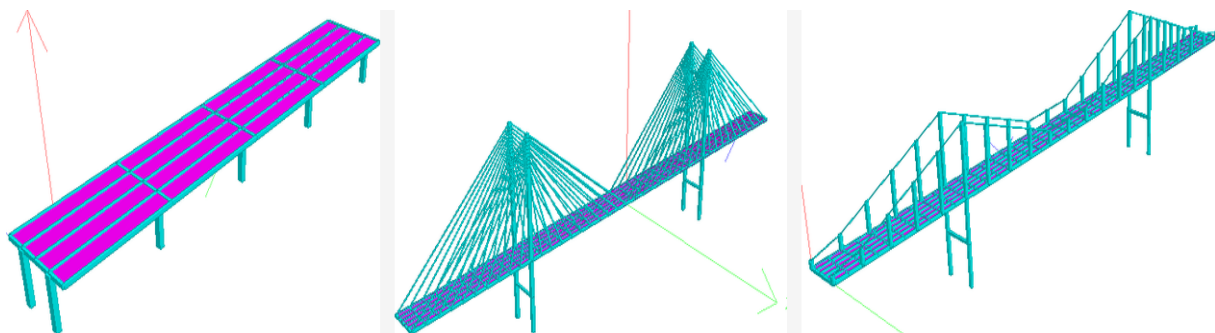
Three-dimensional STAAD.Pro models — (a) Deck Slab Bridge; (b) Cable-Stayed Bridge; (c) Cable Suspension Bridge [Source: STAAD.Pro analysis]
